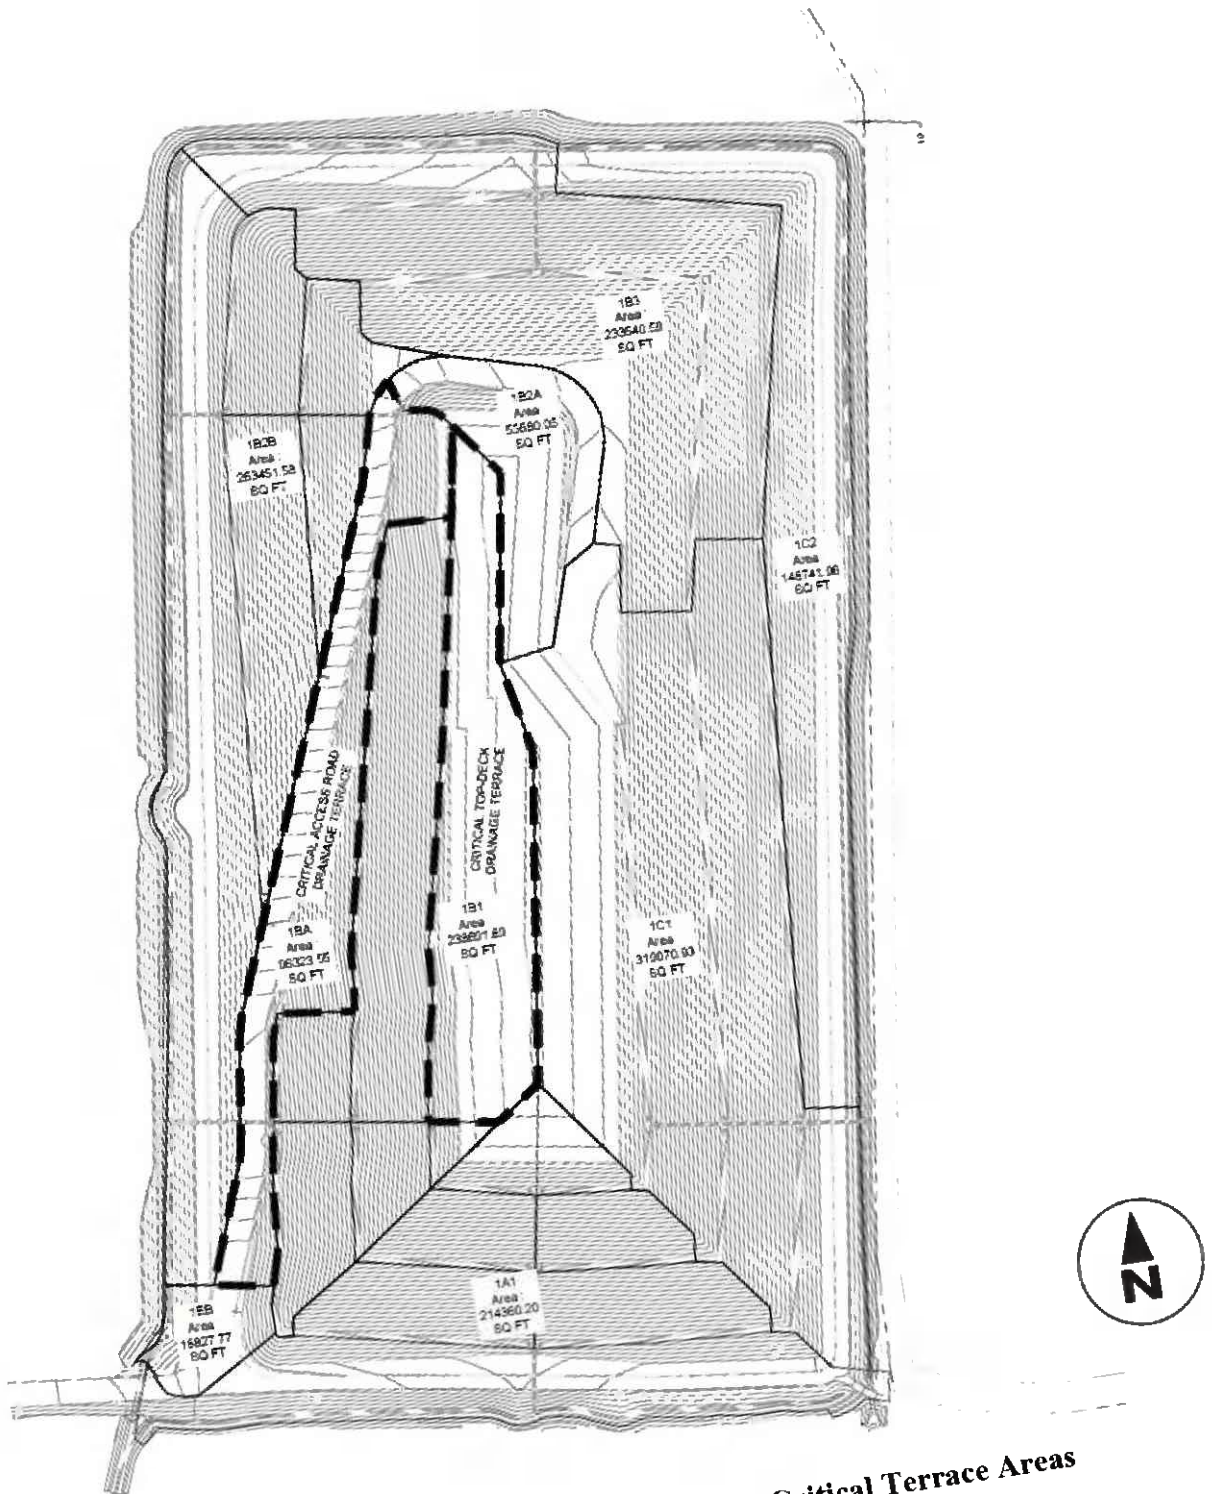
Landfill Area 1 Drainage Plan with Critical Terrace Areas
